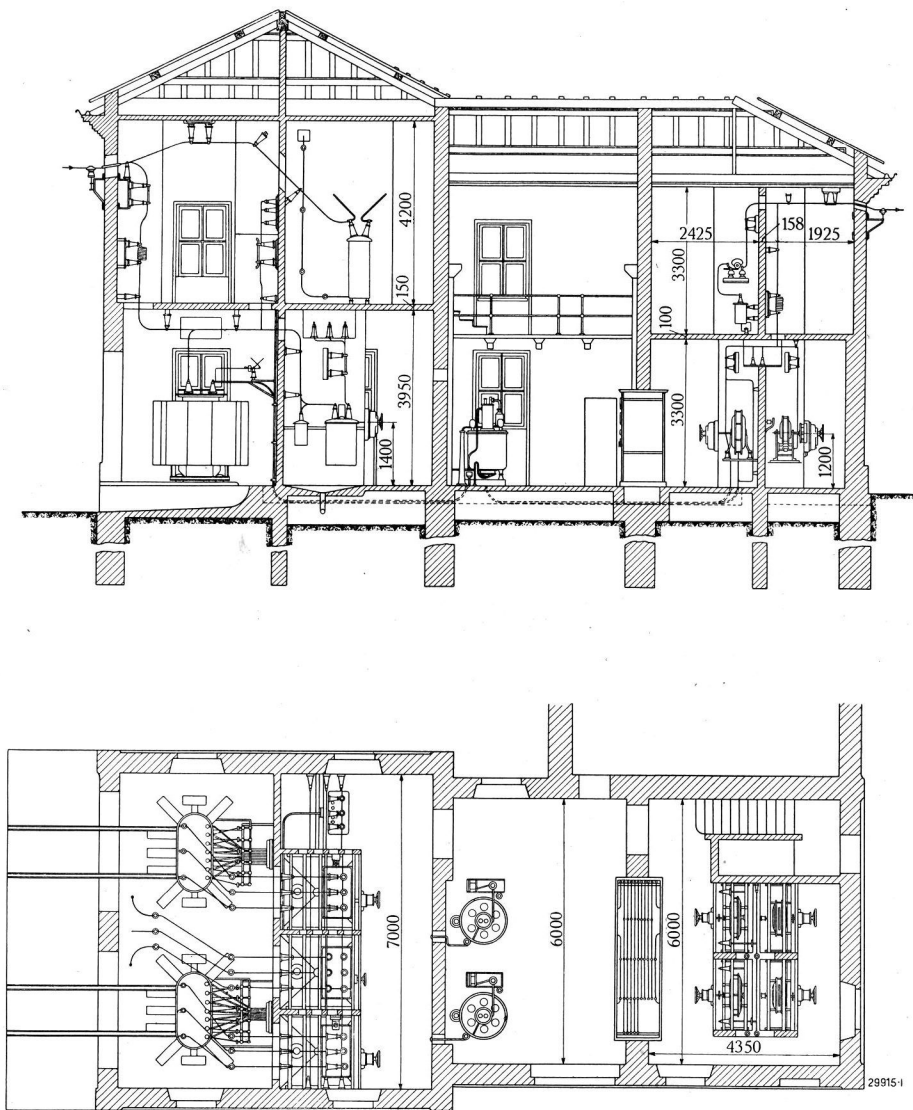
Plan and elevation of Servigiano Automatic Rectifier Substation of the Fermana Railway.
